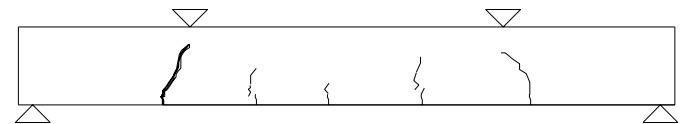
R/C beam with HPFRCC jacket: crack pattern at failure.
